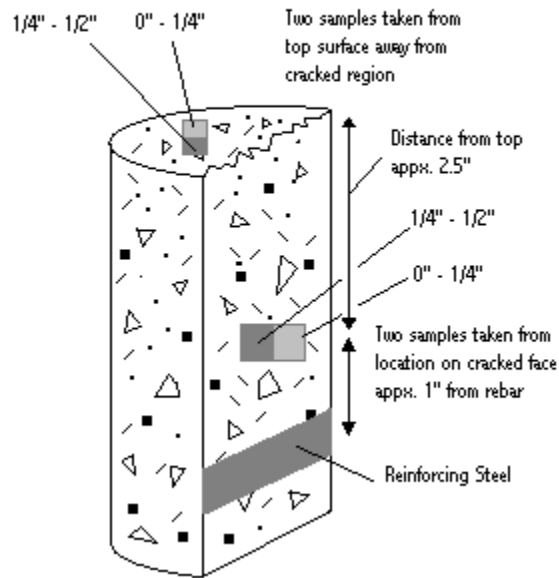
Cracked Soffit Section on Westbound Deck
